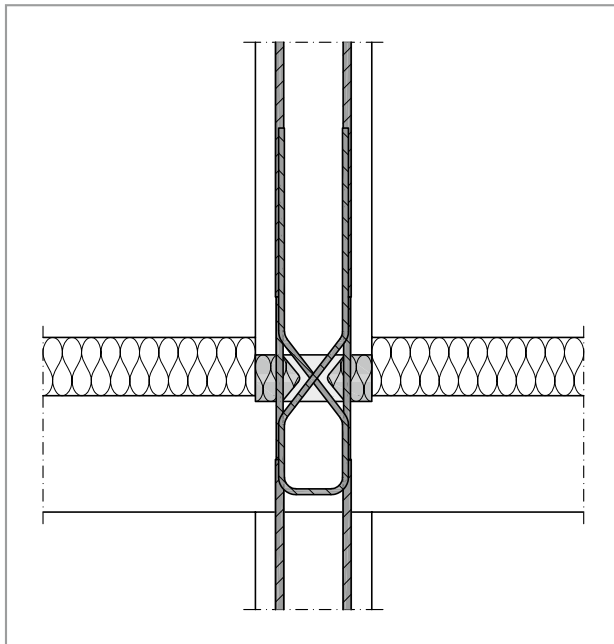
Schöck Sconnex® type W special tension element: Section D-D; Tensile force connection of the walls straight through the floor
